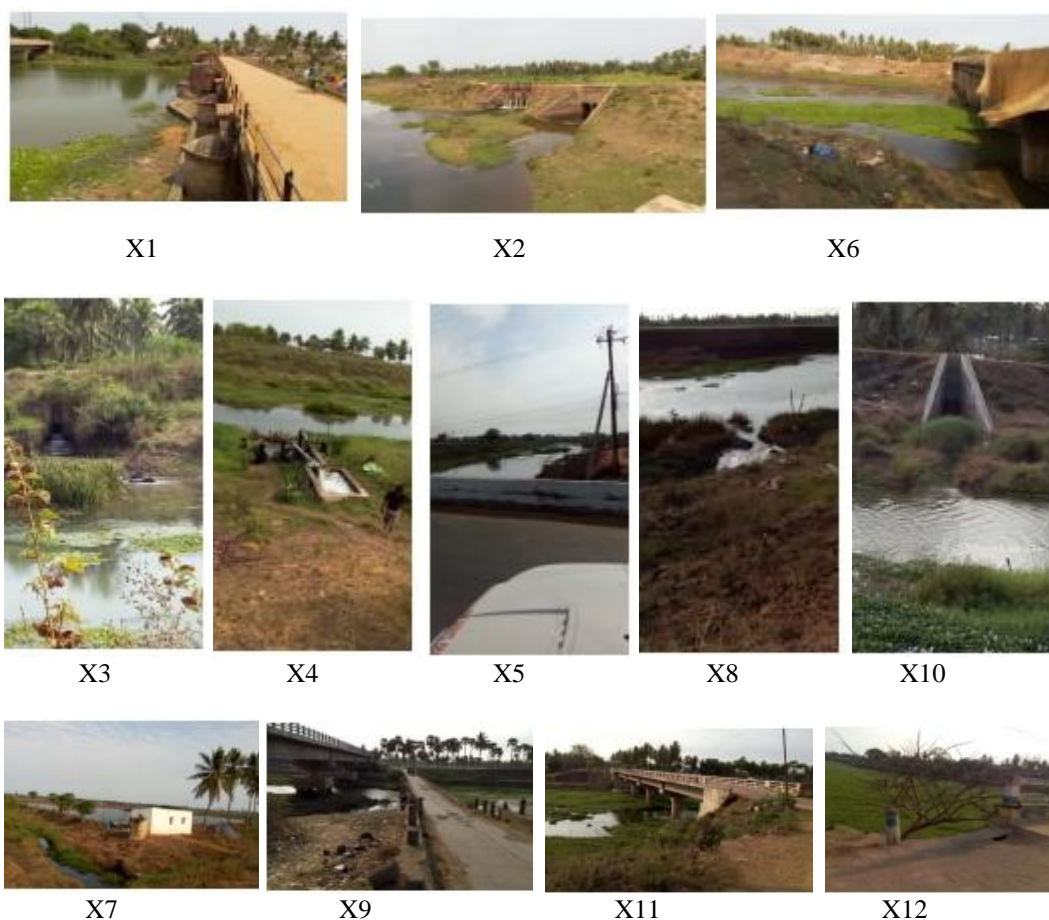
Photographic views of Yenamadurru stretch from Bridge, Duvva to Bridge, Garagaparru (X1-12)
